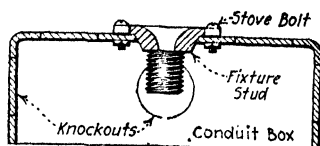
A method of attaching a fixture stud which is to support heavy loads. The stud is inserted through the center knockout of the box.
